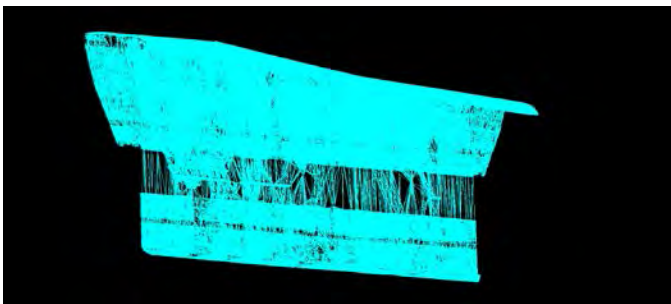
Clean air supply duct, south-west ventilation building, triangulated mesh of divider wall.
